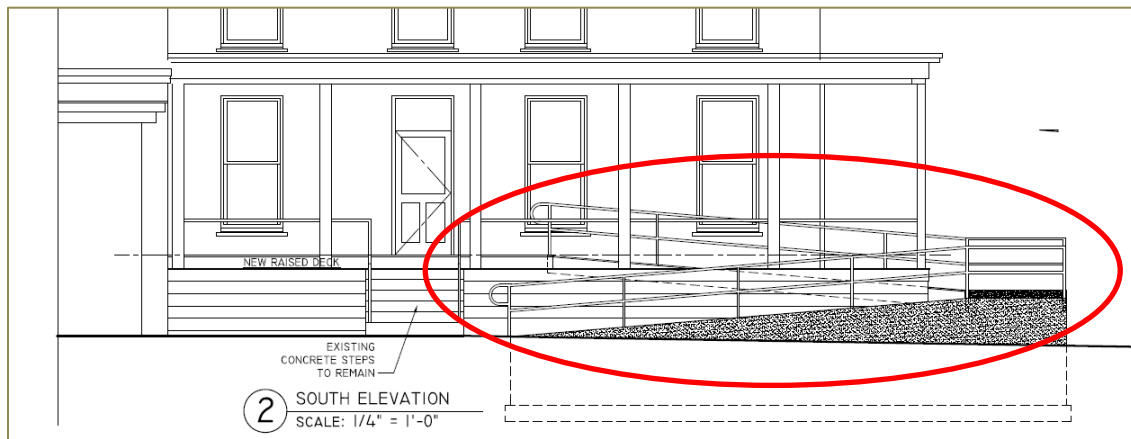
Image of the proposed south elevation submitted by the Applicant. The proposed railing for the ramp is circled in red.
